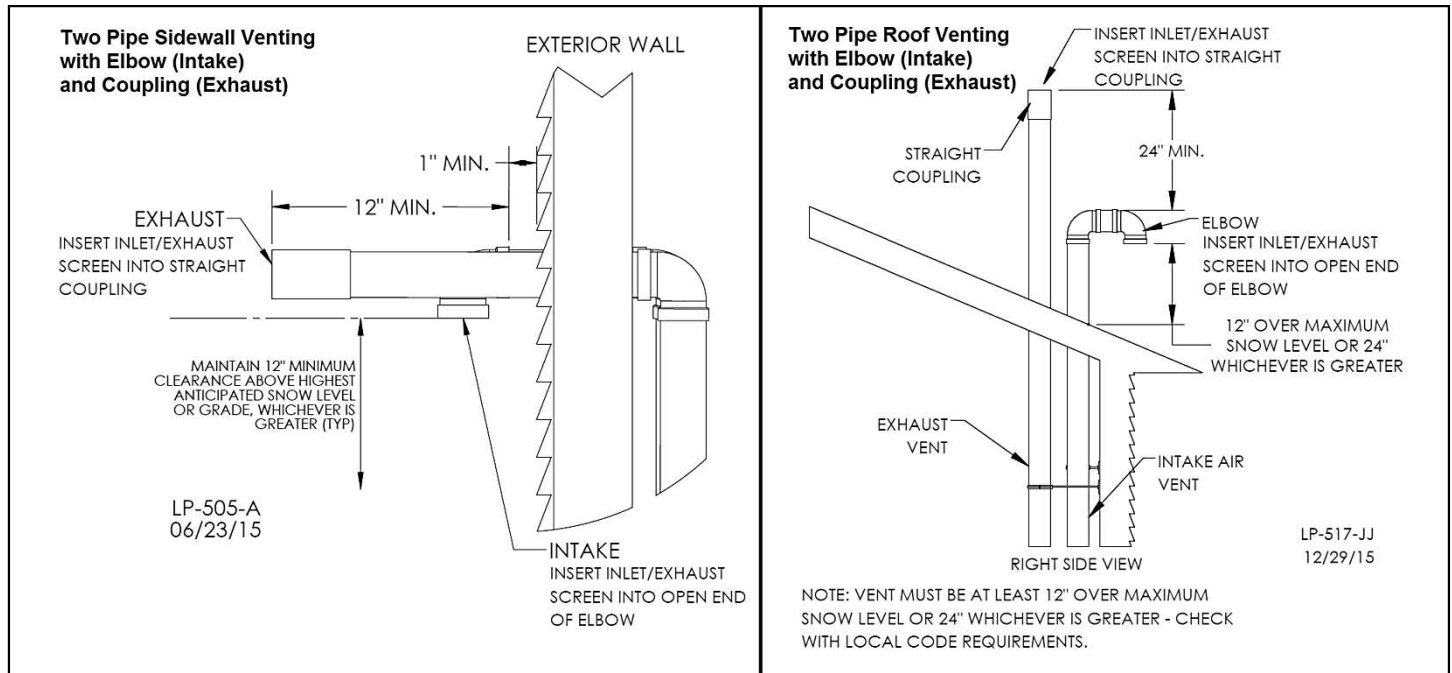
Direct Vent, Roof and Sidewall Vent Terminations
